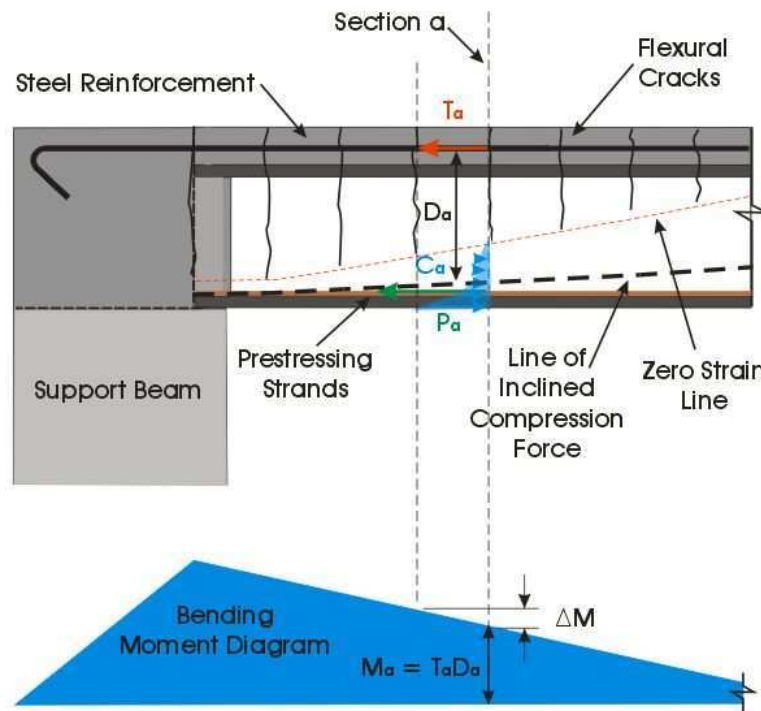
Section of hollow-core floor close to its support under negative moments exhibiting flexural cracks, forces at section “a” are shown
